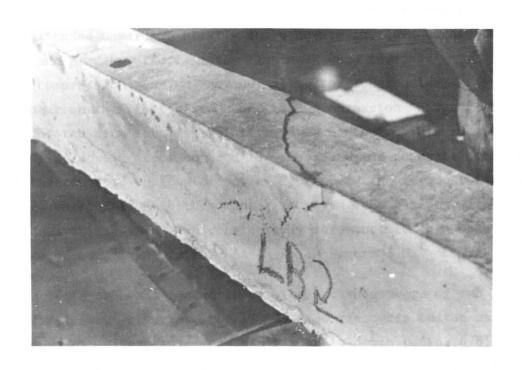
FAILURE OF BEAM CONTAINING ONLY LONGITUDINAL STEEL LOADED IN PREDOMINANTLY TORSION.
